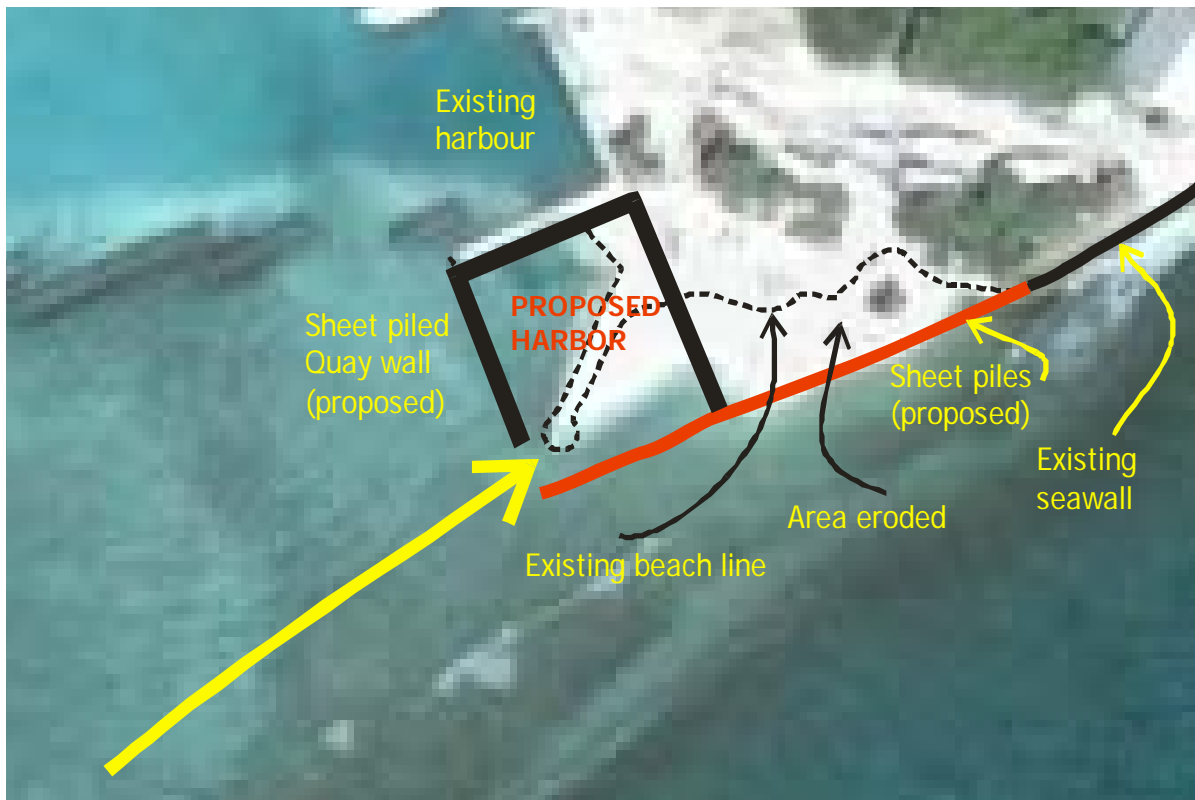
Details of the southeast corner of Fullmoon to show the existing the proposed structures. Note the area eroded and the existing the seawall which terminating at the corner.
